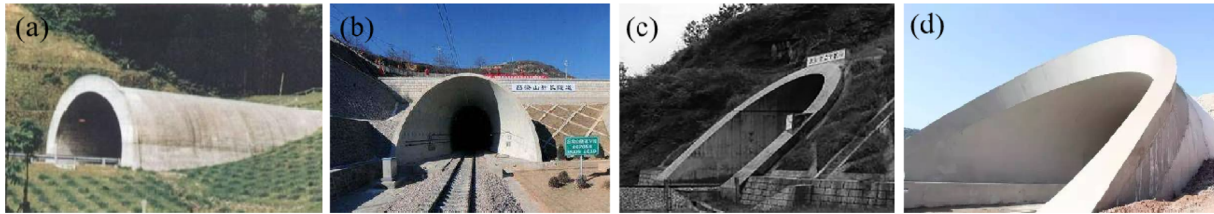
Traditional buffer hoods: (a) enlarged cross section, (b) linear horn shape, (c) gradient, and (d) hat oblique.
